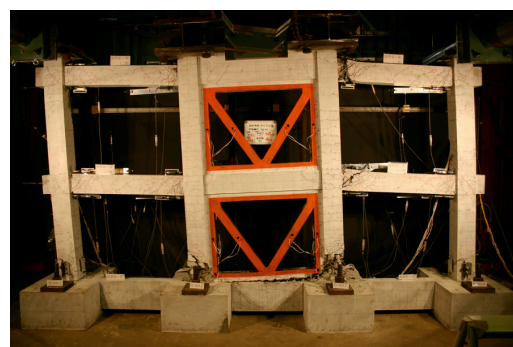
Column tension failure of Specimen No.3 under tri-lateral loading
